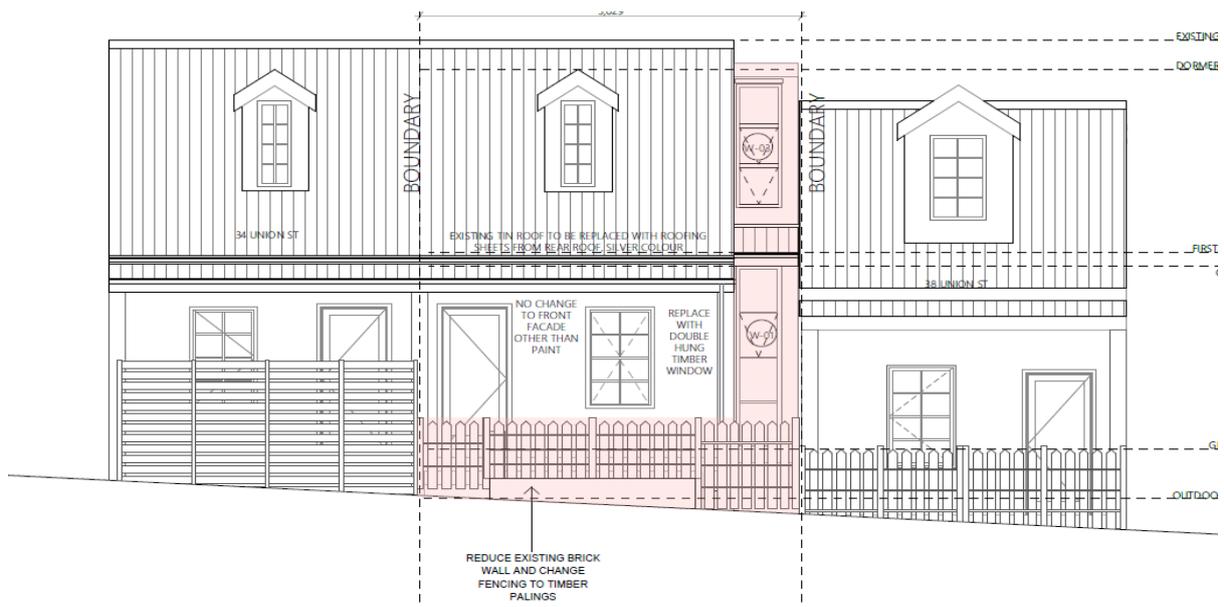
Proposed Union Street Facade (extent of new works outlined in red)
